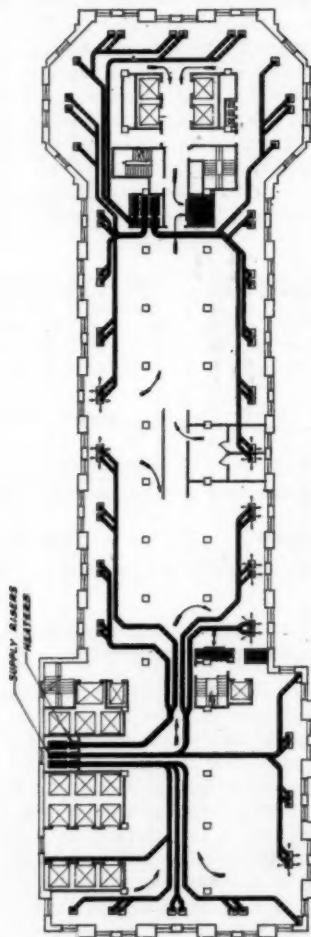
ARRANGEMENT OF DUCTS ON OFFICE FLOORS
